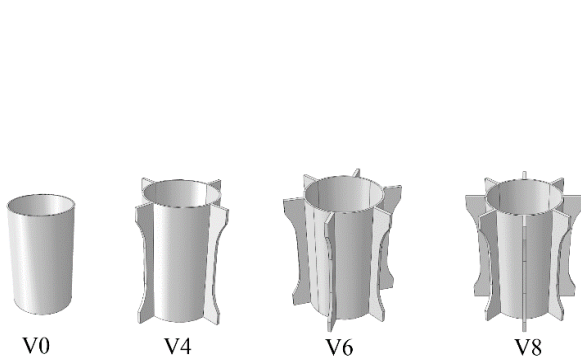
Illustration of every variant of circular hollow steel damper and finned circular hollow steel damper.
